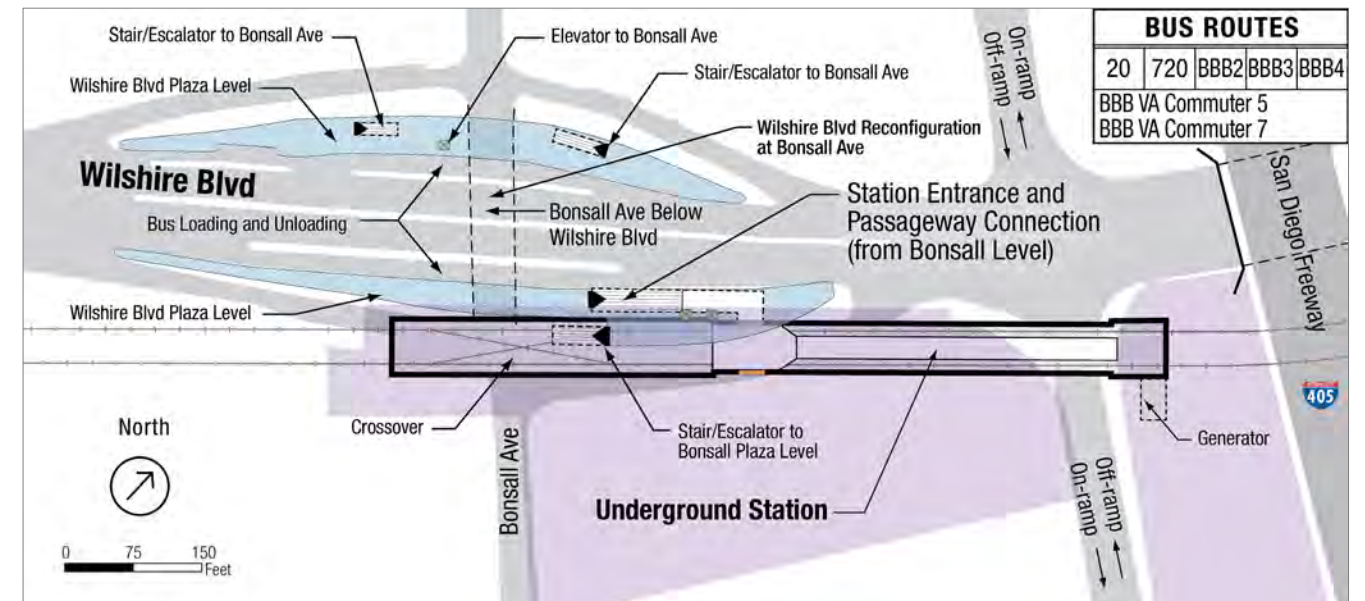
Westwood/VA Hospital South Station Site Plan
